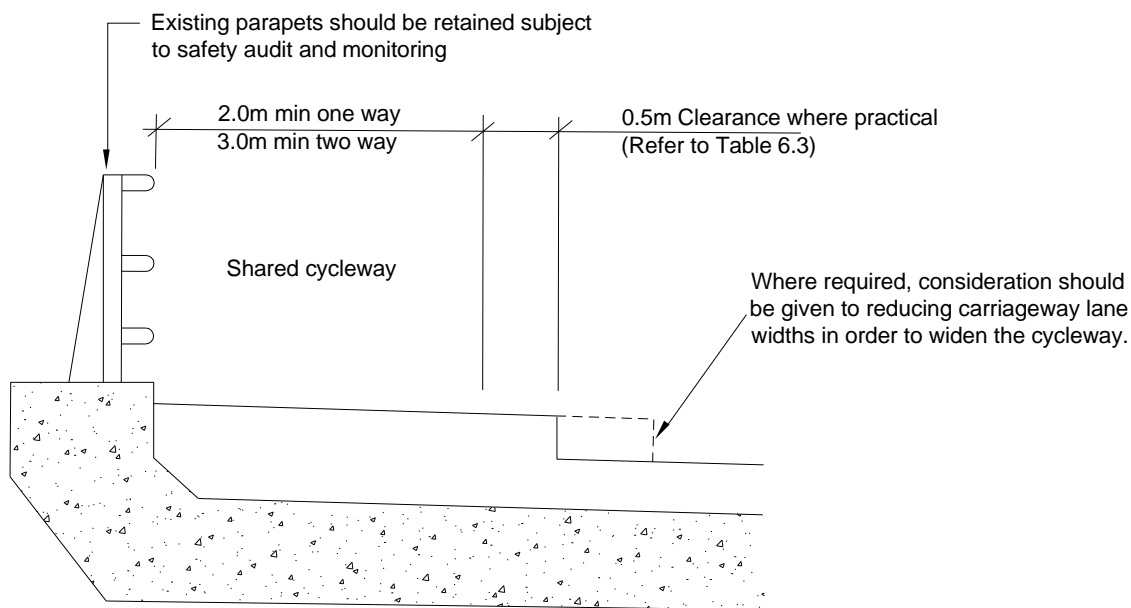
B : EXISTING ROAD BRIDGE SECTION
